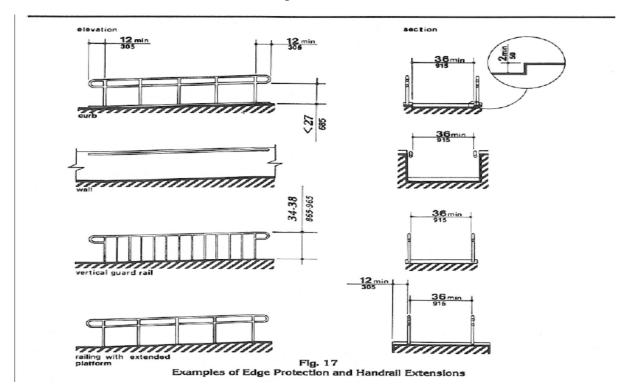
Examples of Edge Protection and Handrail Extension (ADA 2010 standards)
